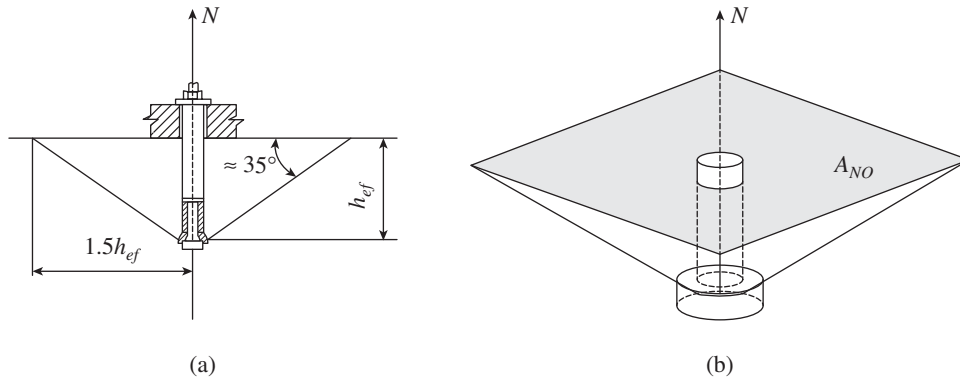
Concrete breakout failure under tensile loading according to ACI 318 (a) Tensile loading on anchor (b) Assumed truncated pyramidal concrete breakout
